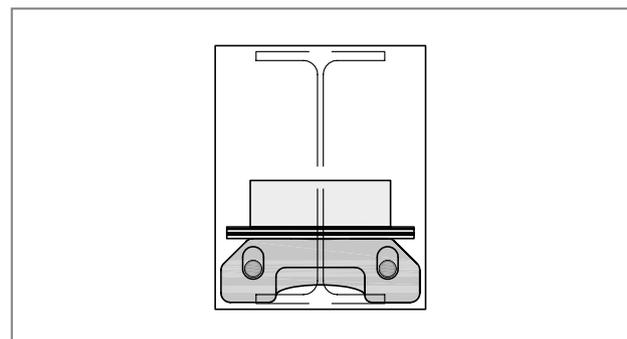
Schöck Isokorb® T type SQ: Shims on the load plate raise the position of the steel beam by up to 20 mm
